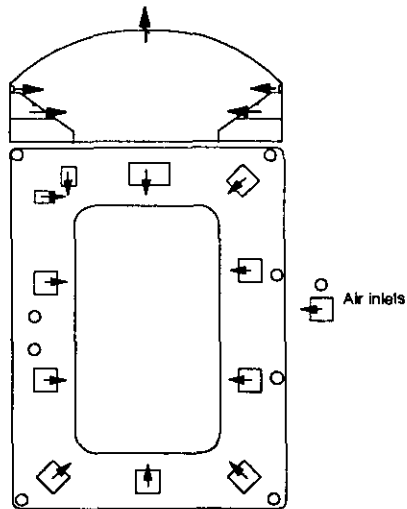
Gjøvik Olympic Mountain Hall, air inlet and outlet in principle. Section and plan view.
